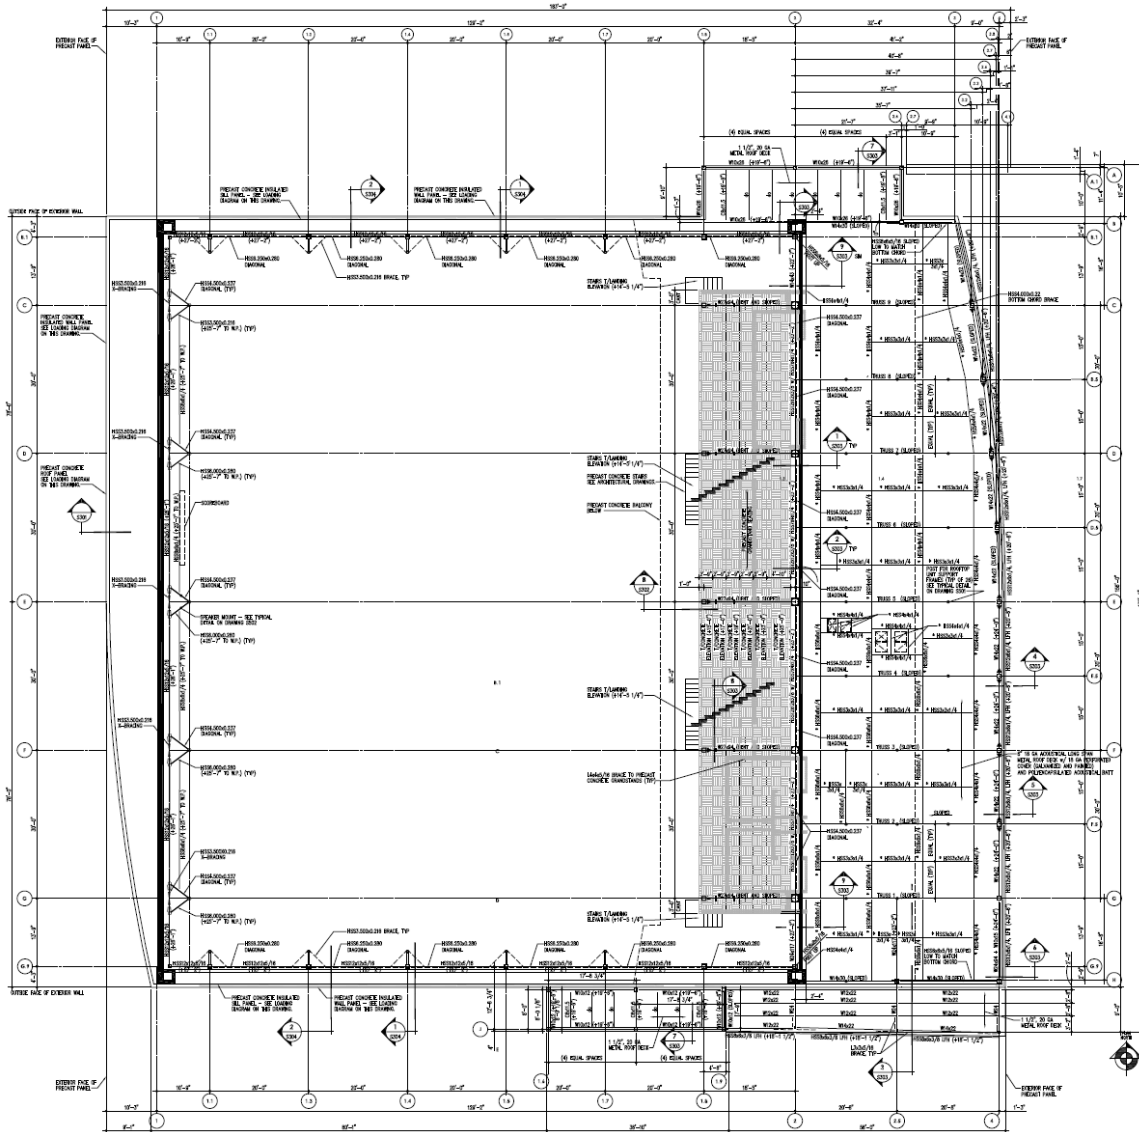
Gallery/Mezzanine Level Framing Plan (the shaded portion is the grandstand seating area)
